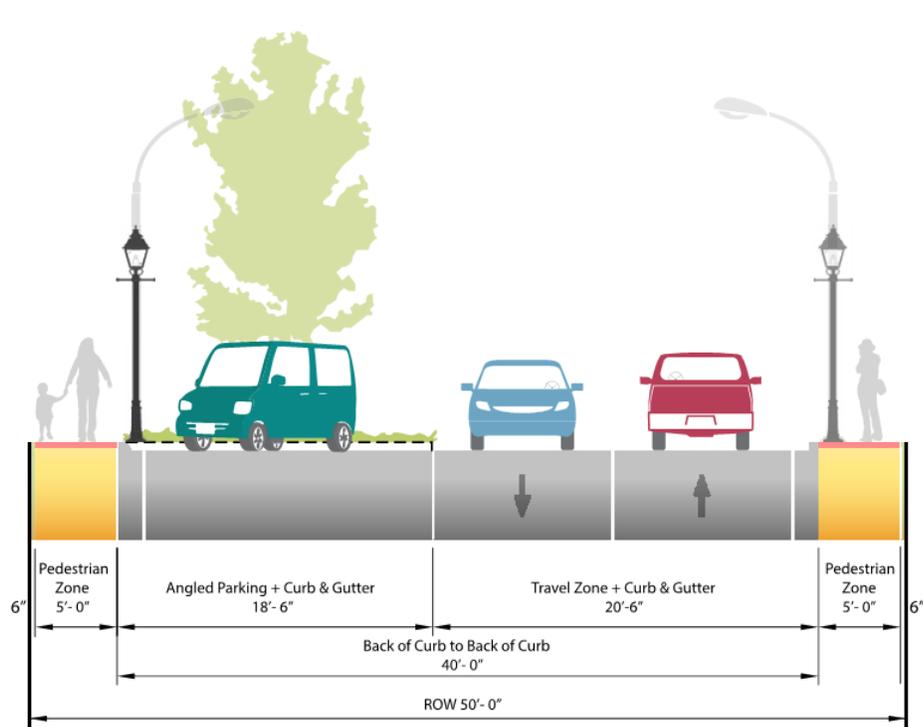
Proposed North Alexander St Complete Streets Cross Section with Angled Parking (North of Ascension St)
